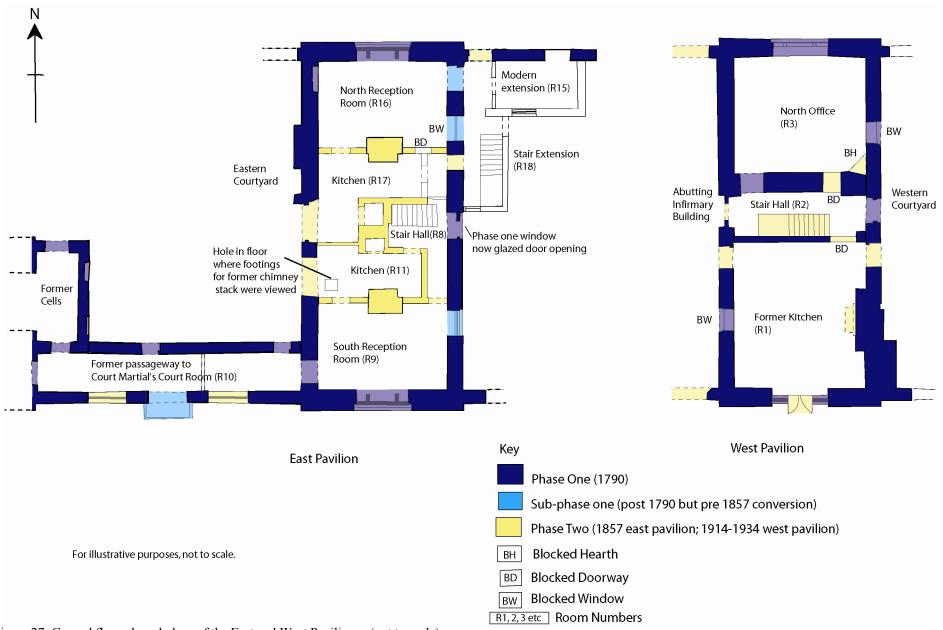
Ground floor phased plans of the East and West Paviliopns (not to scale).
